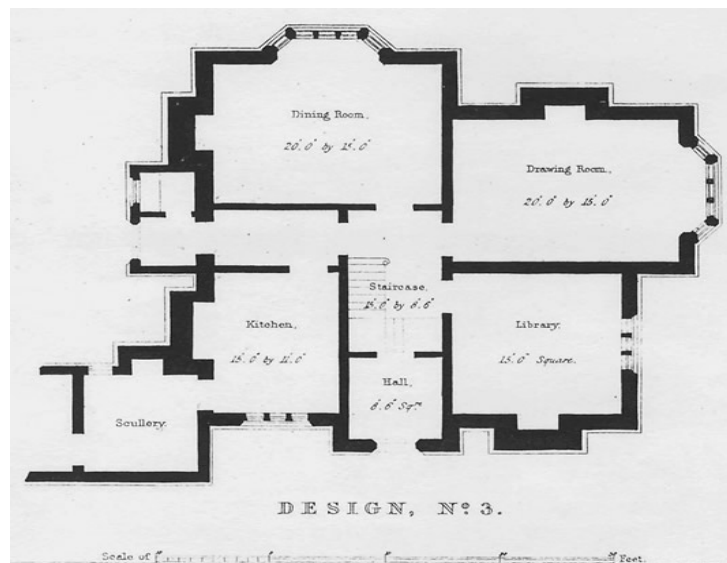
European Villa, 1838 – Floor Plan (www.housemouse.net)
